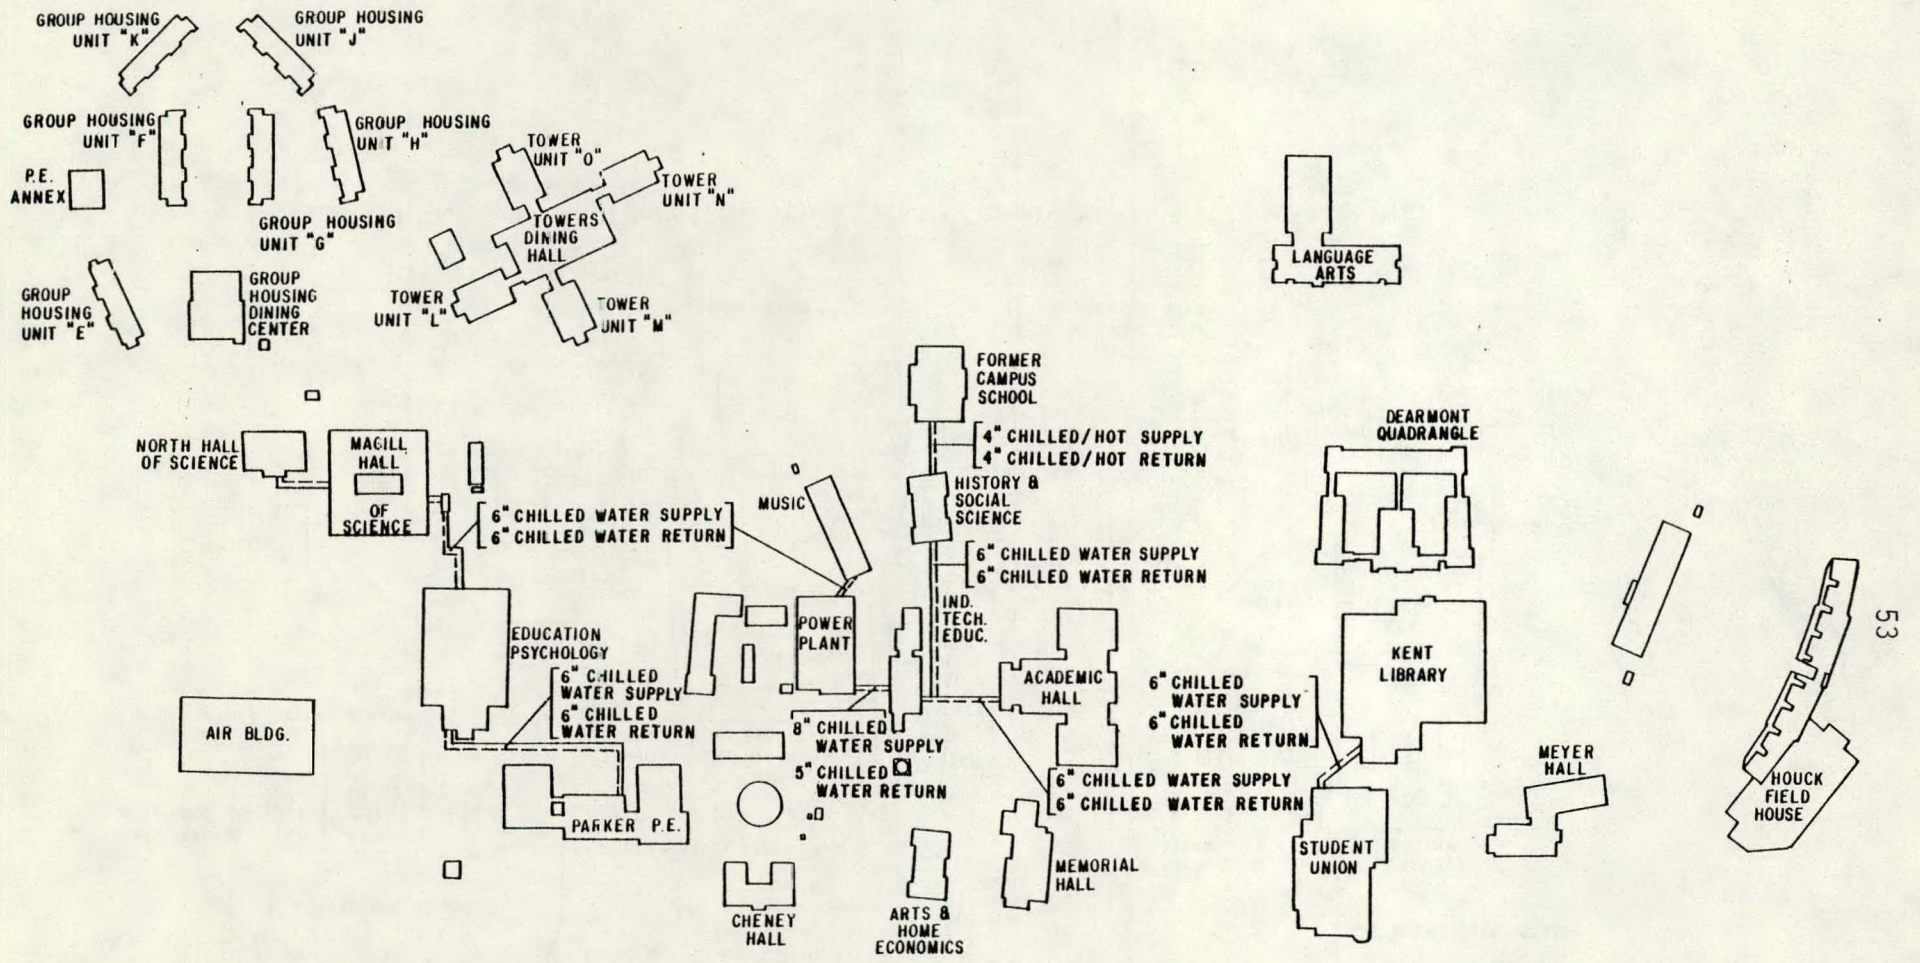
Southeast Missouri State Campus Chilled-water System Site Plan
